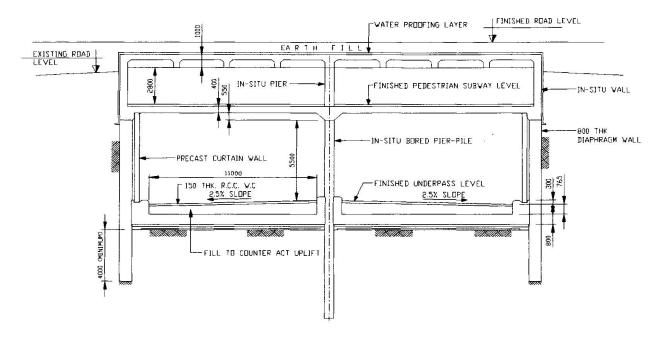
Cross Section of Underpass and Pedestrian Subway at Intersection
